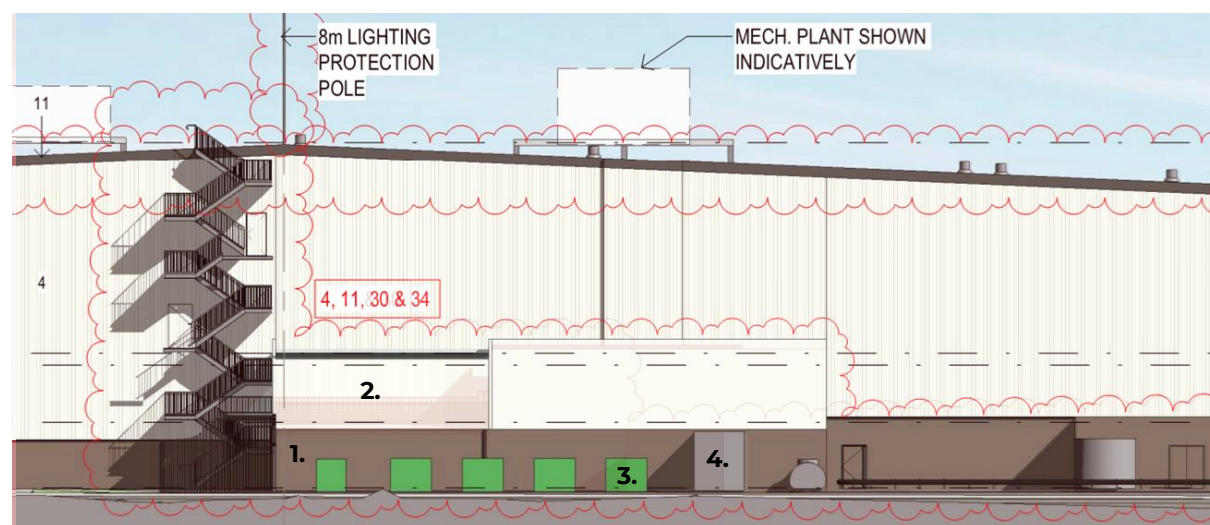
Revised Plant Area Elevation (Source: Nettleton Tribe, 2022)
